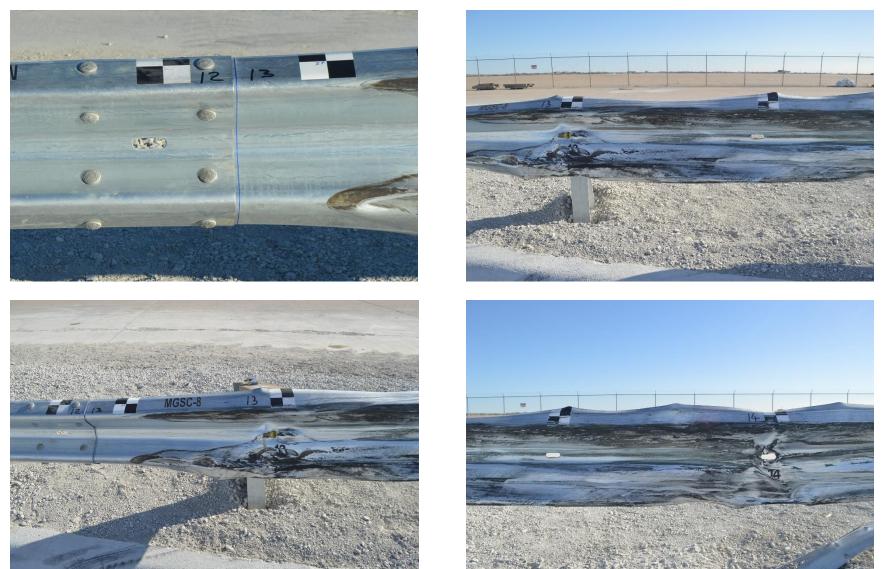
System Damage, Guardrail at Post Nos. 12 through 14, Test No. MGSC-8
